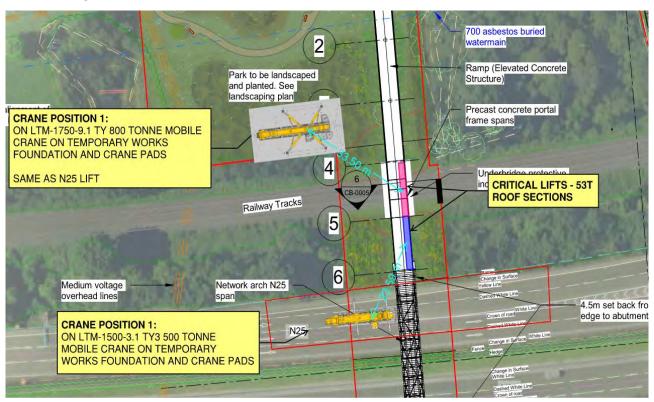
Proposed methodology for erection of precast portal frame elements of railway spans
